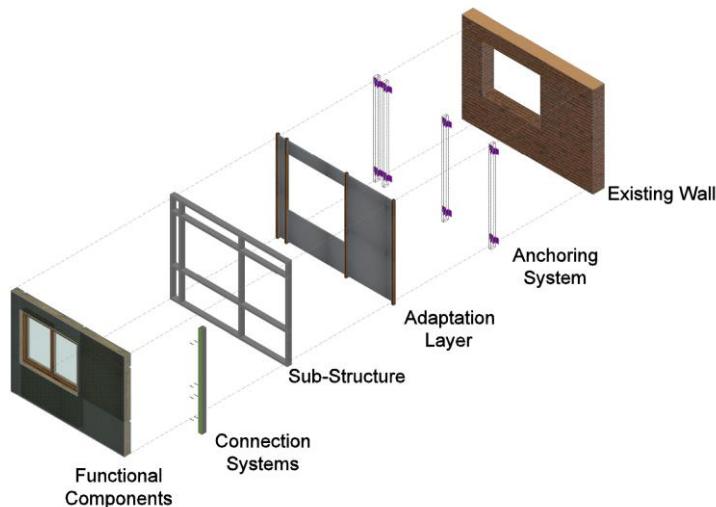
Ontological scheme of a timber-frame prefabricated façade for the retrofit of existing buildings (Credits: Eurac Research).
